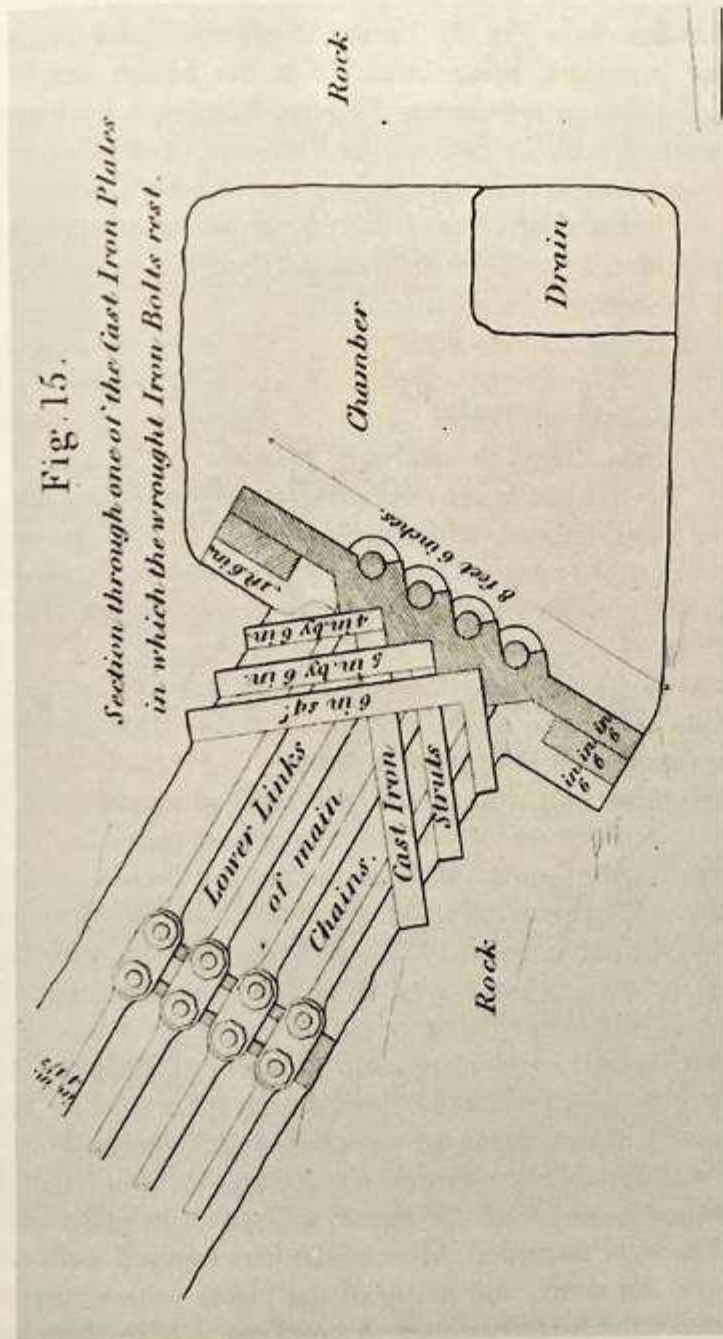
(b). Anchorage evolution: Menai Bridge as built (Provis, ref. 9, plate 9)
